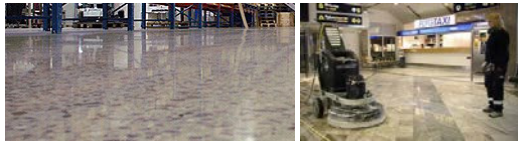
HTC Superfloor and a HTC floor grinding machine.
